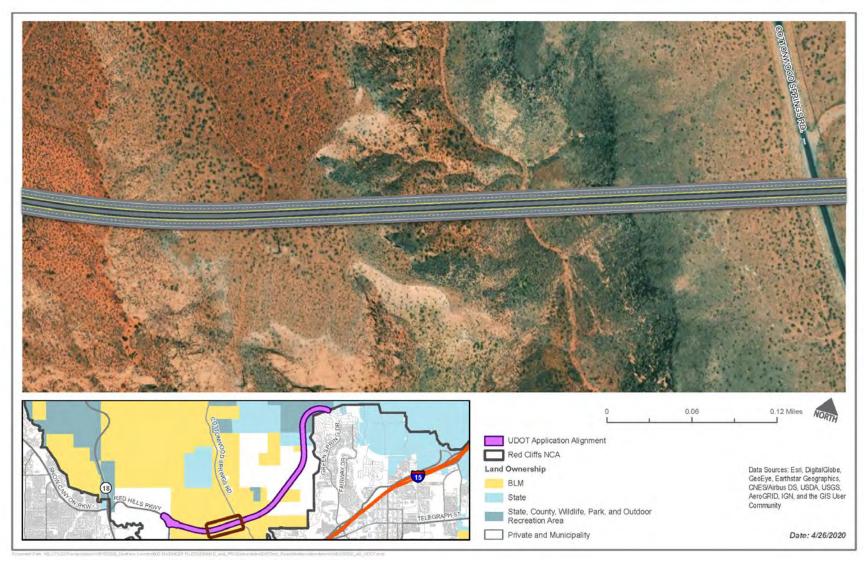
UDOT Application Alignment Plan View (3 of 9)
